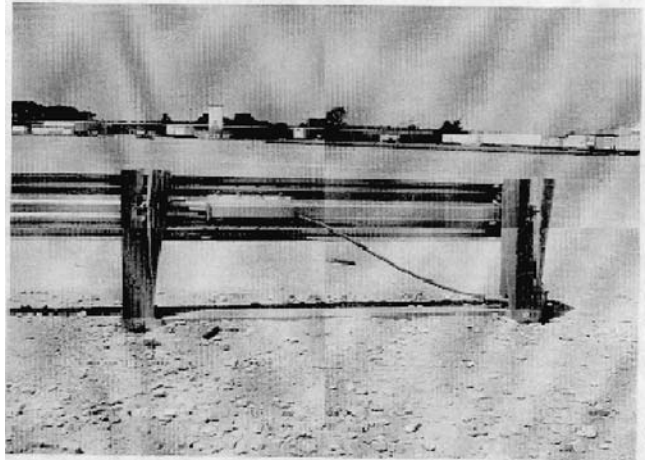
Guardrail terminal damage during Test NEC-1 (29).
